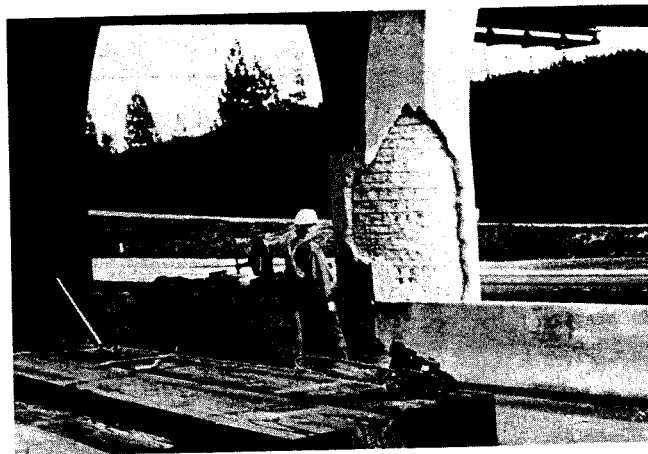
Spalling of concrete shell in column of 118/Ruffner Avenue overcrossing.
